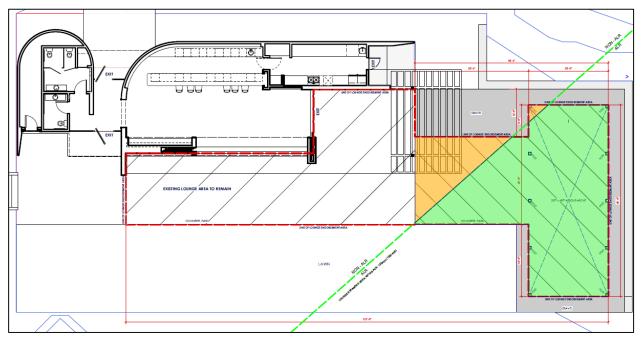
Site Plan Showing Proposed Outdoor Lounge Area in Red (Green area in ALR; orange area outside ALR)
